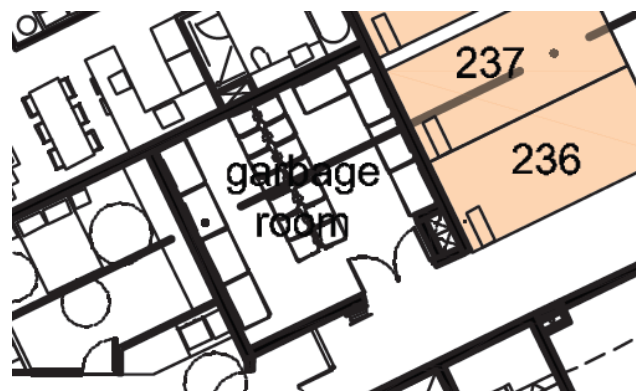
BIN ROOMS (BUILDINGS 1, 3 & 4)
